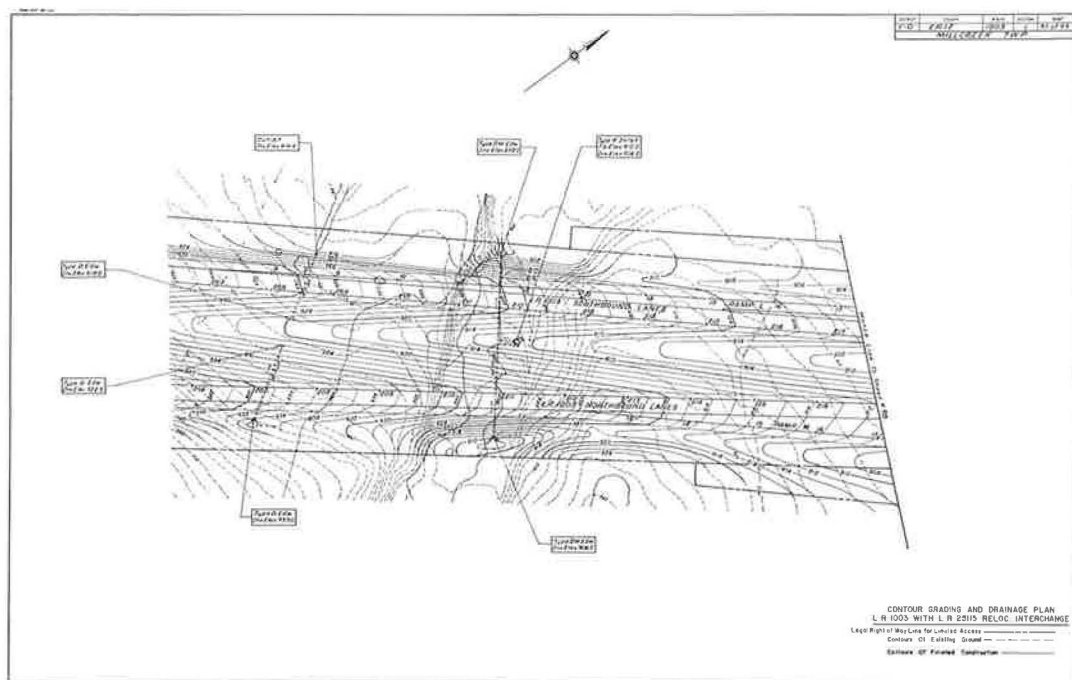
Representation of contour grading and drainage plan (not to original scale).
